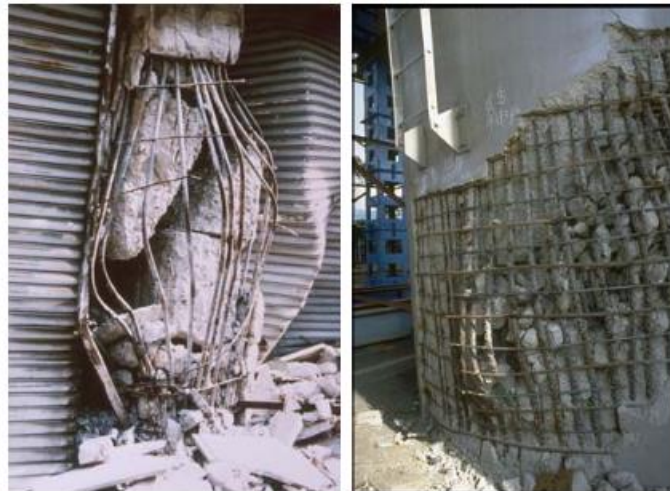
Examples of brittle and ductile failures in reinforced concrete (Balandier, 2004)
